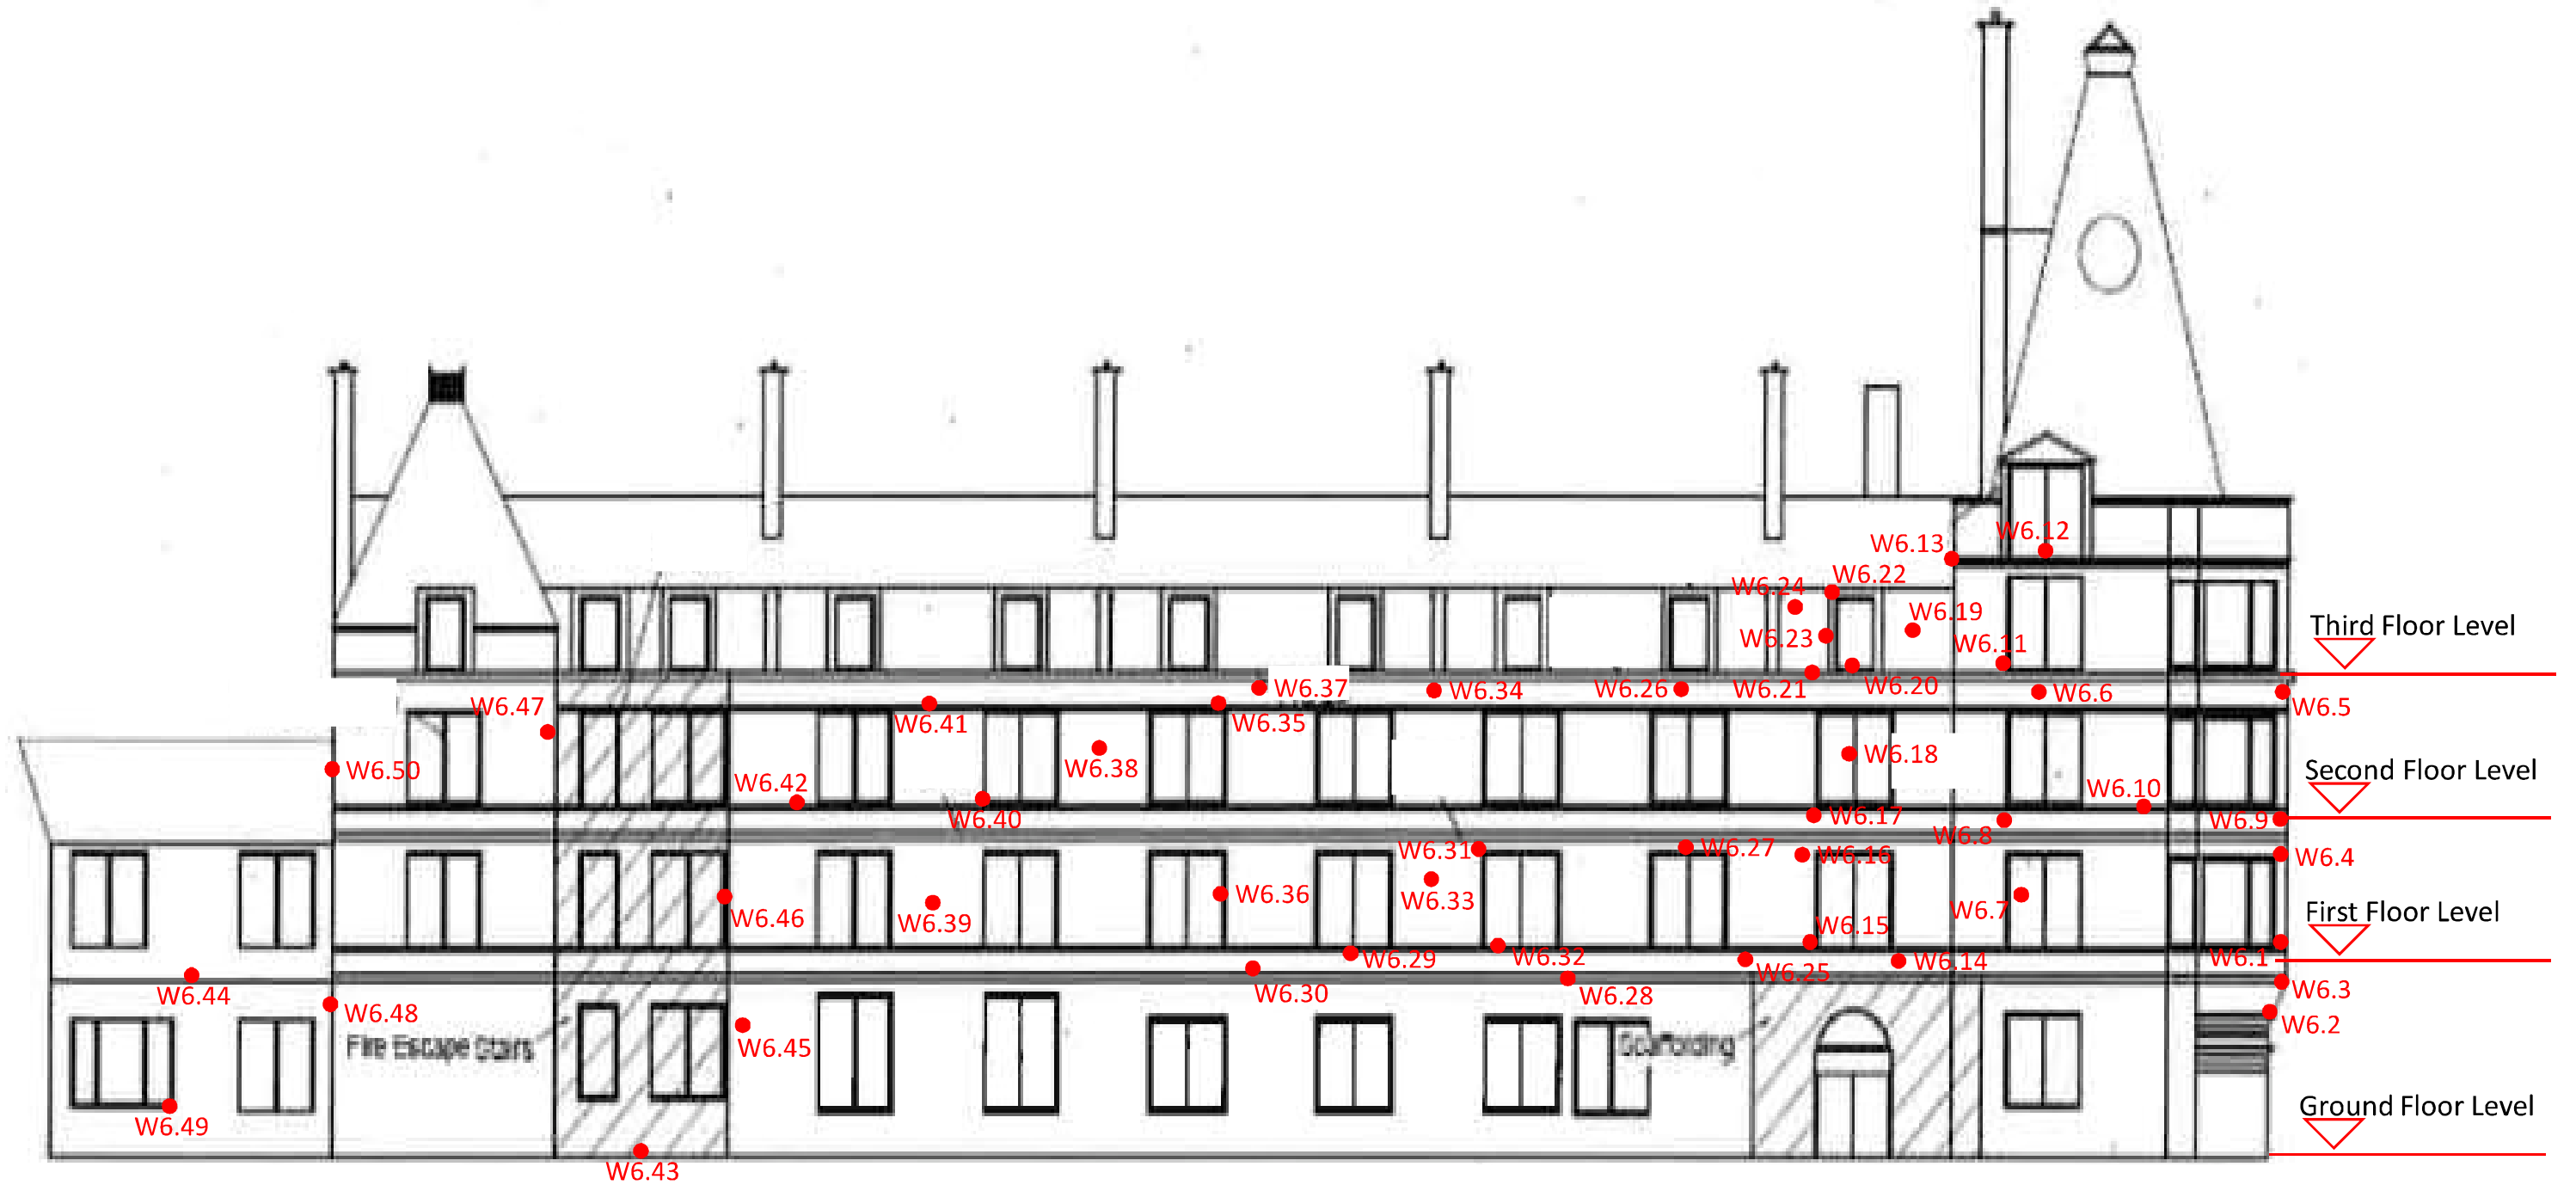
Elevation W6 of Station Hotel Building showing Defect/Observation Locations
